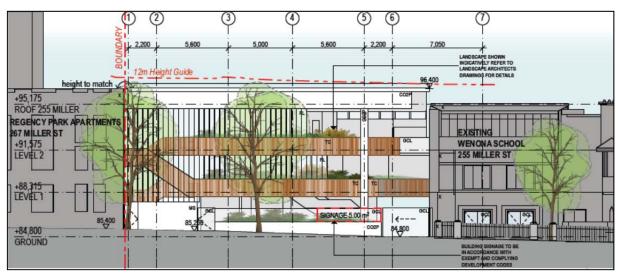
Miller Street Elevation showing the proposed height consistent with existing streetscape (Source: EIS)
